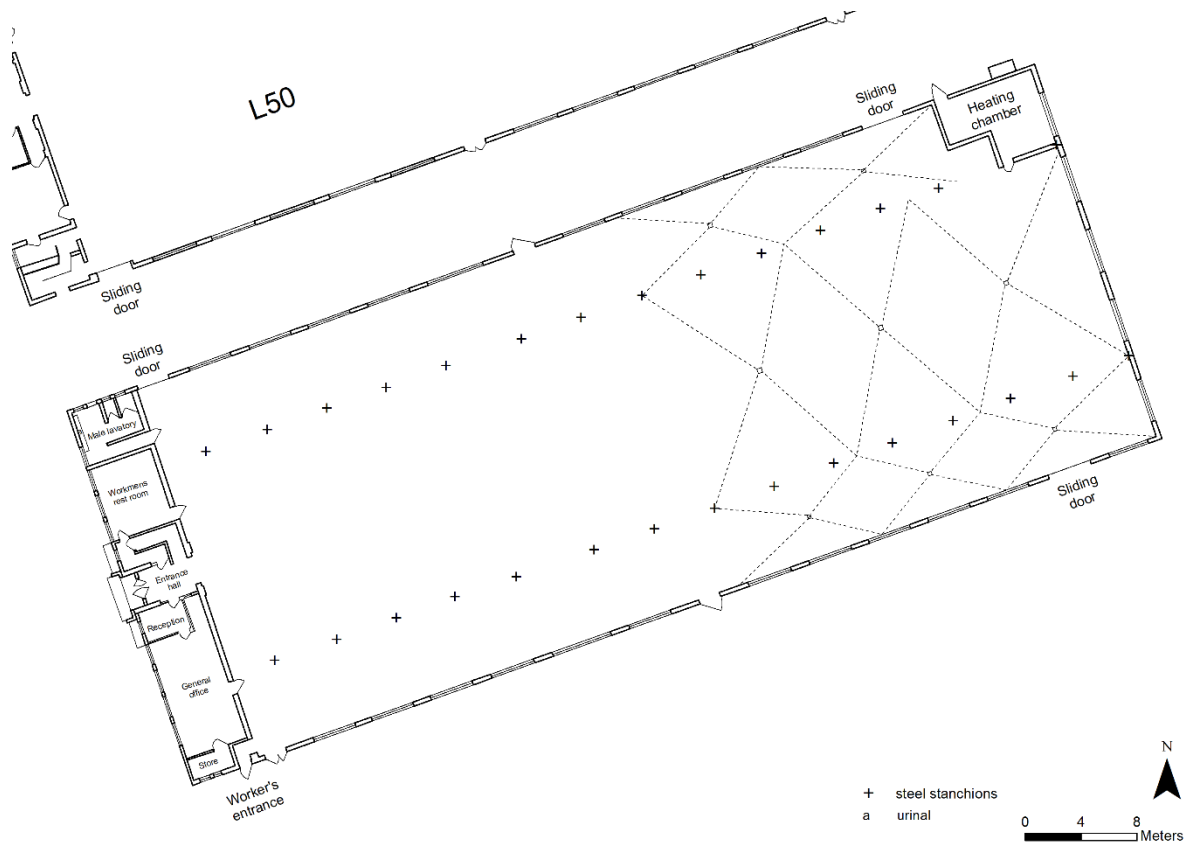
L92 as built based on the building control plan TWAM CB.GA/BC/plan/NET/87.
